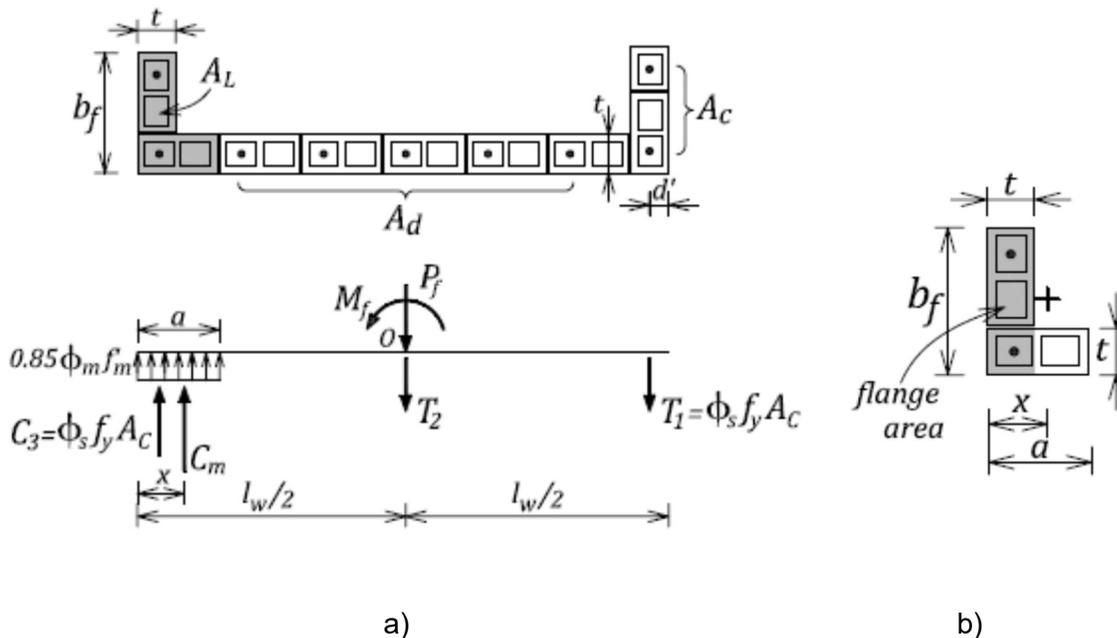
Flanged wall section: a) internal force distribution; b) flange geometry.
